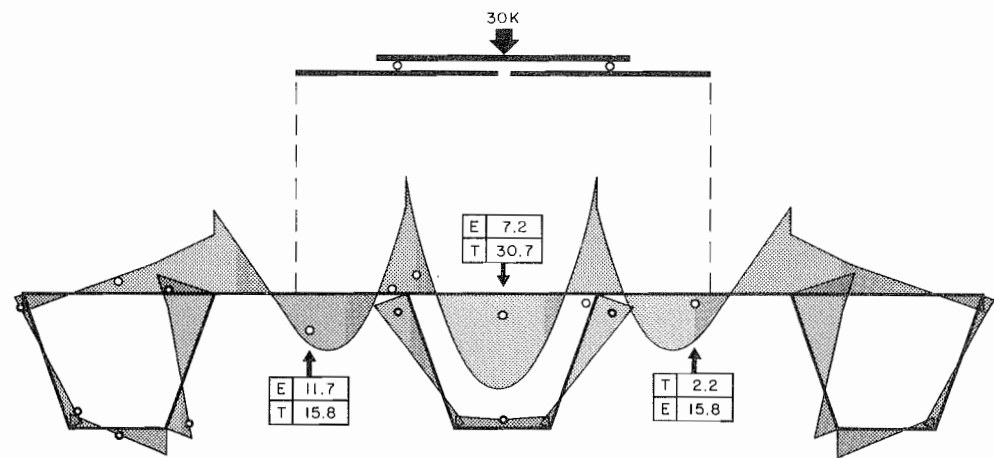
LONGITUDINAL STRESSES ON TOP SURFACE OF DECK PLATE AND OUTER SURFACE OF RIB WALLS, BRIDGE I.
